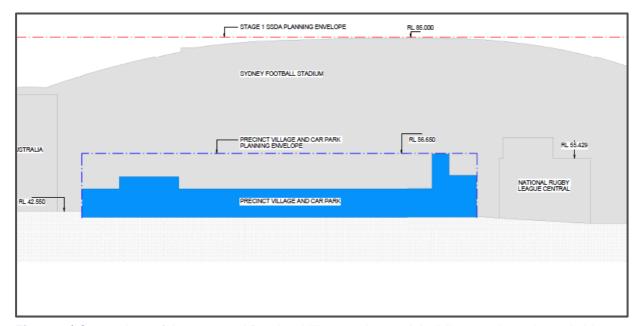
| Comparison of the proposed Precinct Village and carpark building envelope shown in blue and stadium envelope and surrounding administration buildings shown in grey (Source: Modification 6 Architectural Plans)
